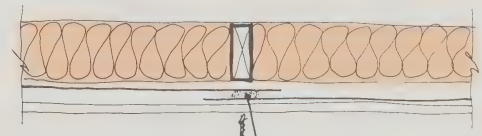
INSTALLATION OF AIR/VAPOUR BARRIER ON EXTERIOR WALLS
